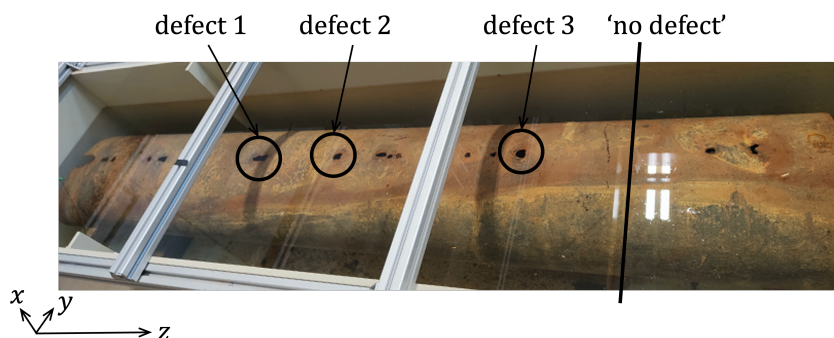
Set up for measurements using a robotic platform showing the locations of testing for robotic platform. Locations are labeled by the position of the accelerometers.
